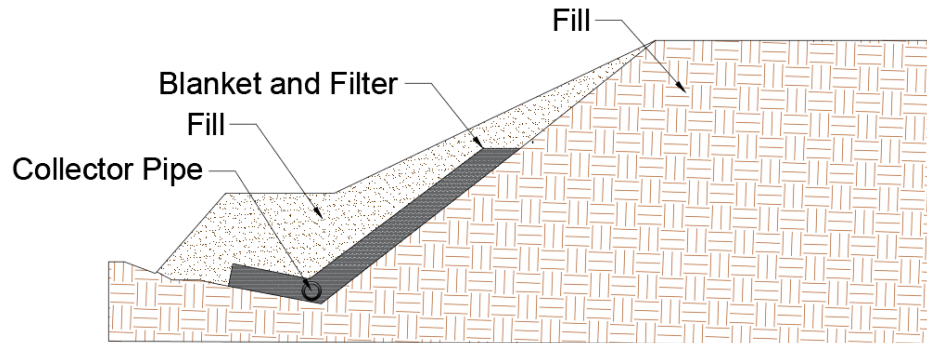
Typical drainage blanket (Adopted from Collin et al. (2008))
